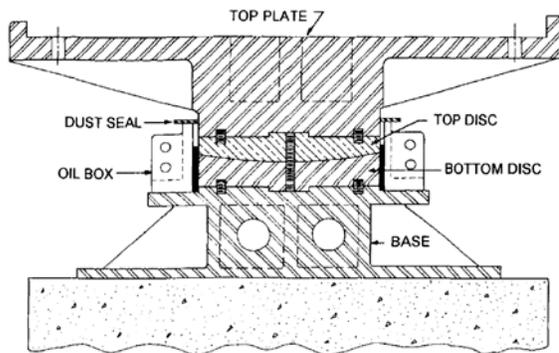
Cross-sectional view of a center bearing; a split circular oil box surrounds bearing. Notice that none of the discs or plates are bolted together.
